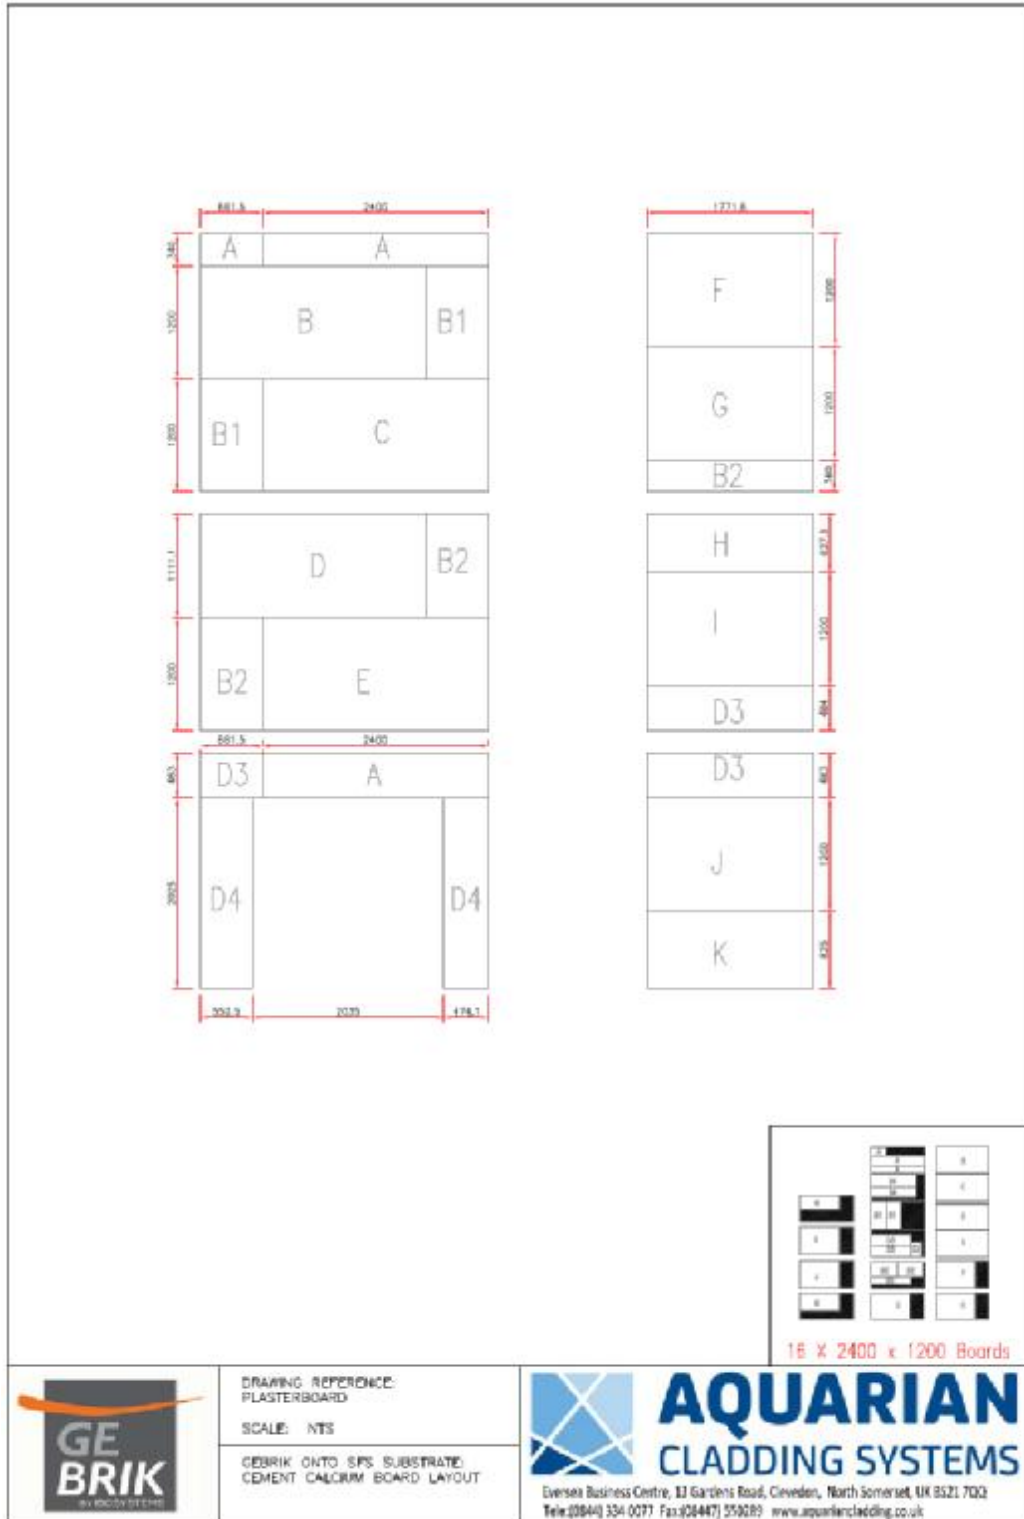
Construction of the System showing the layout of the cement calcium board (layer 2).
